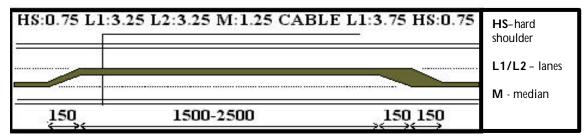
Proposed standard for 2+1 cable barrier cross-section within existing 13 m road
